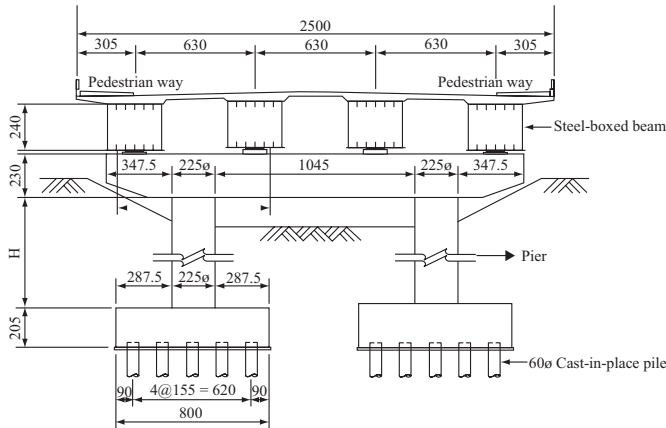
Schematic diagram of cross-section of Wann-fwu bridge.
